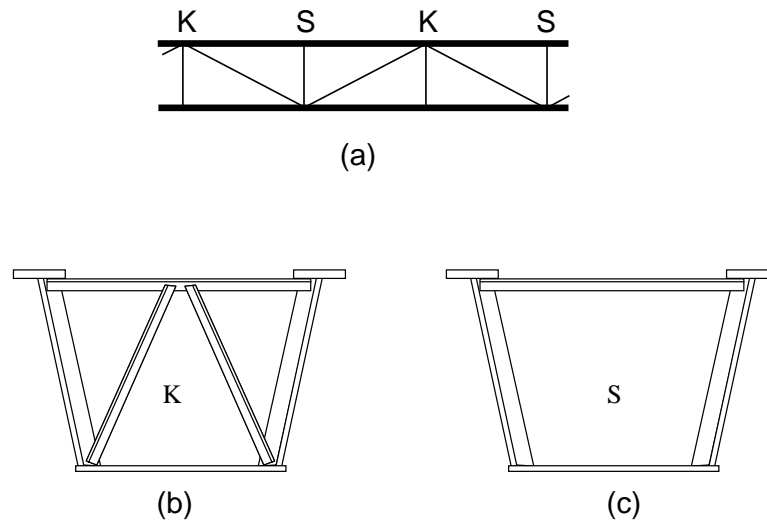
Girder Bracing Details at Top Truss Panel Points
